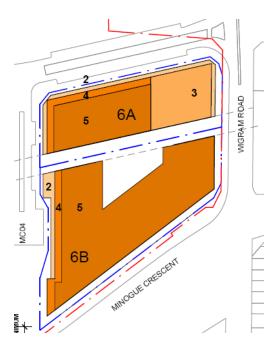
Building levels plan shows no upper level setbacks along Minogue Crescent for Building 6B.
